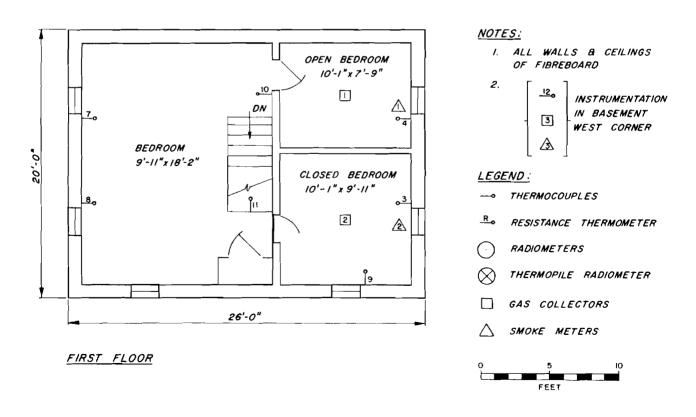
BUILDING No. 3 - TWO - STOREY SOLID BRICK DWELLING
